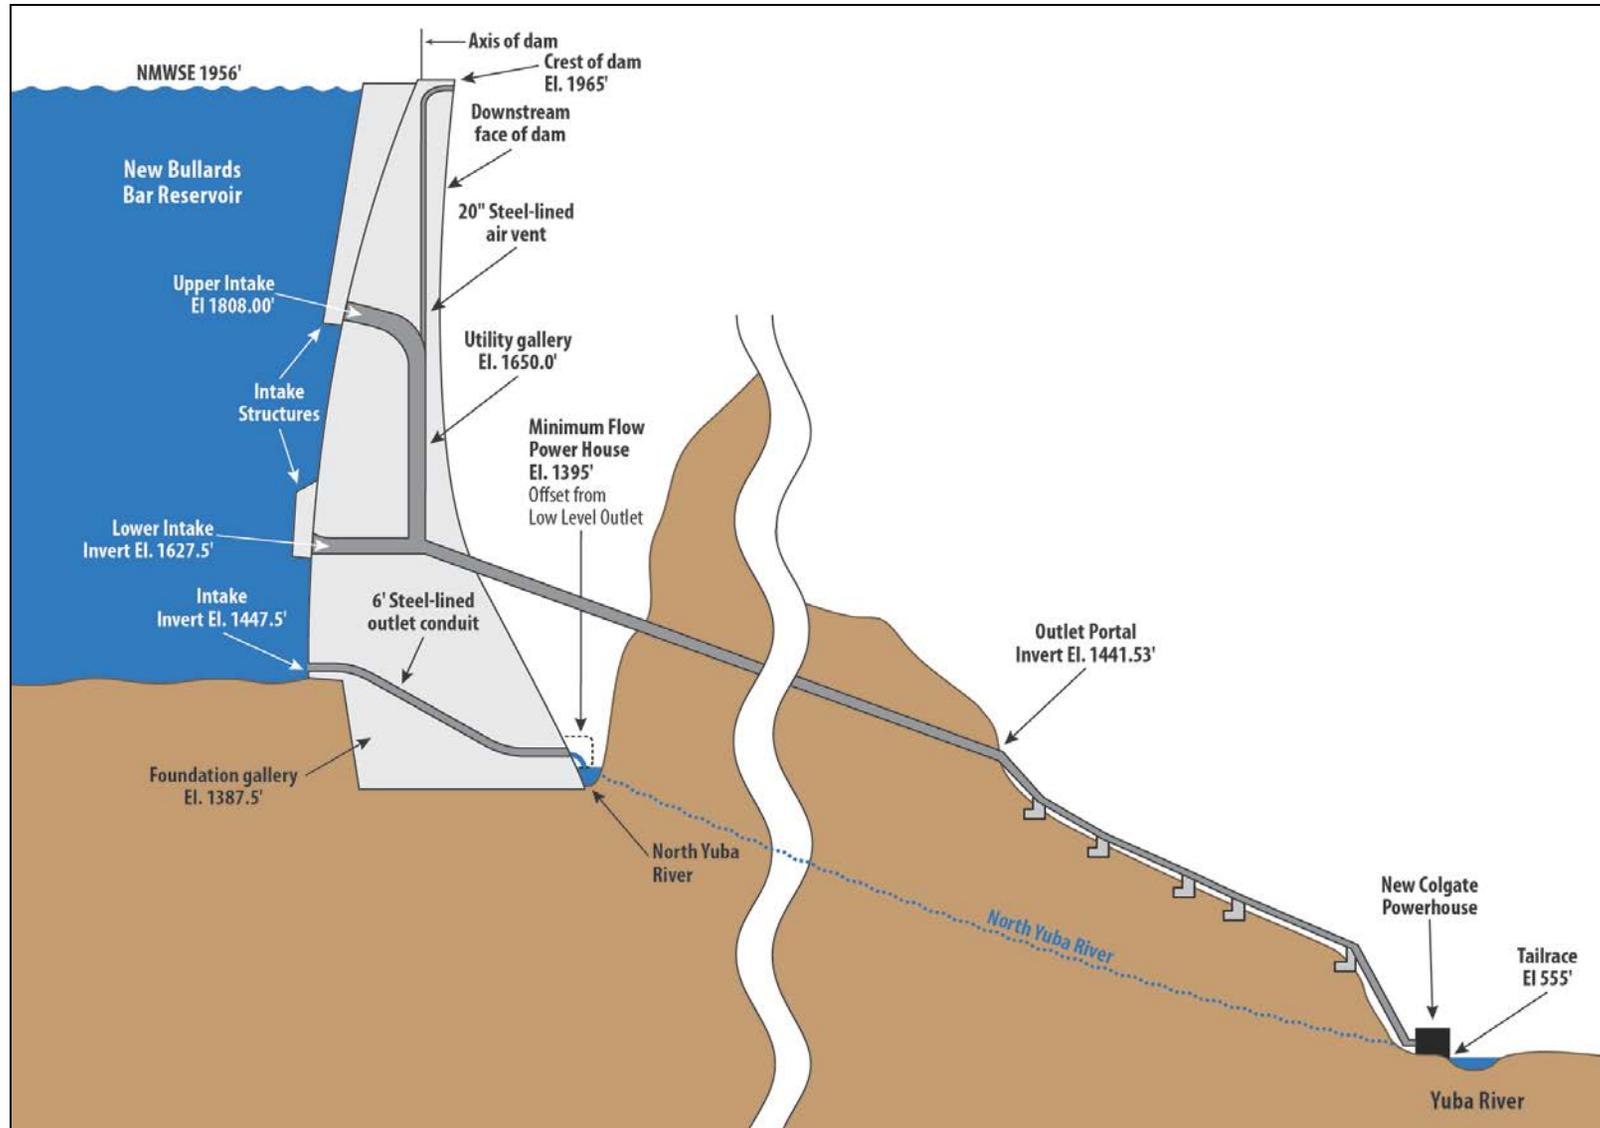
Longitudinal schematic of New Bullards Bar Dam on the North Yuba River and New Colgate Power Tunnel and Powerhouse on the Yuba River.
